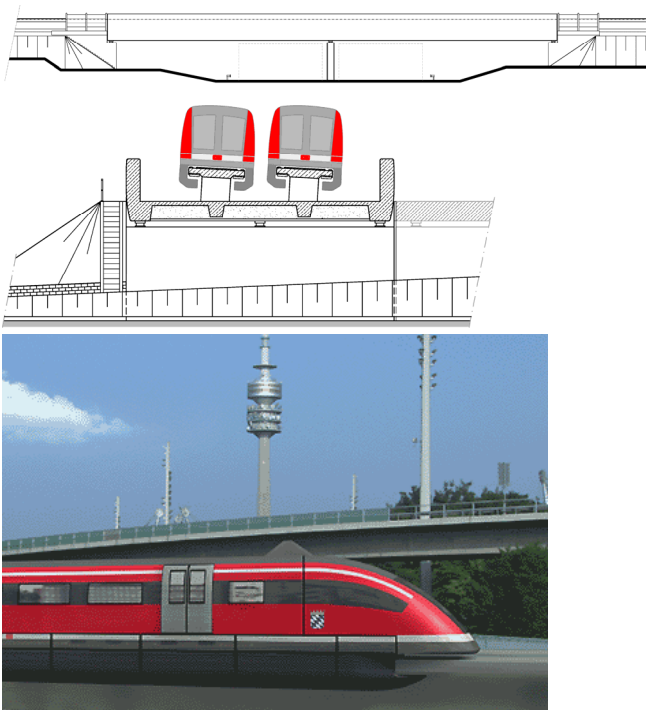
Urban bridge construction - e.g. Georg-Brauchle-Ring
